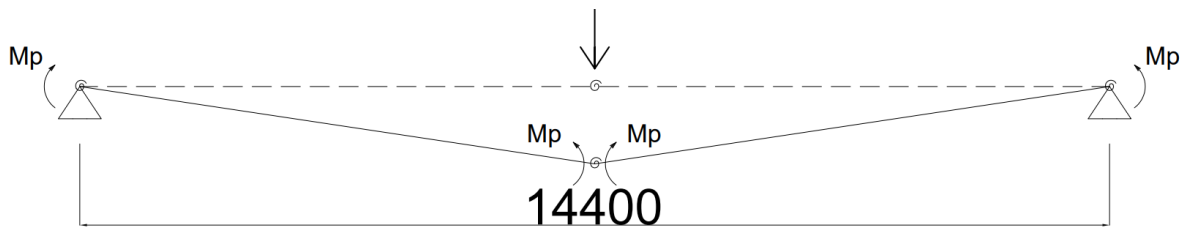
Interior or facade column removed, single span beams supported by semi-rigid connections
